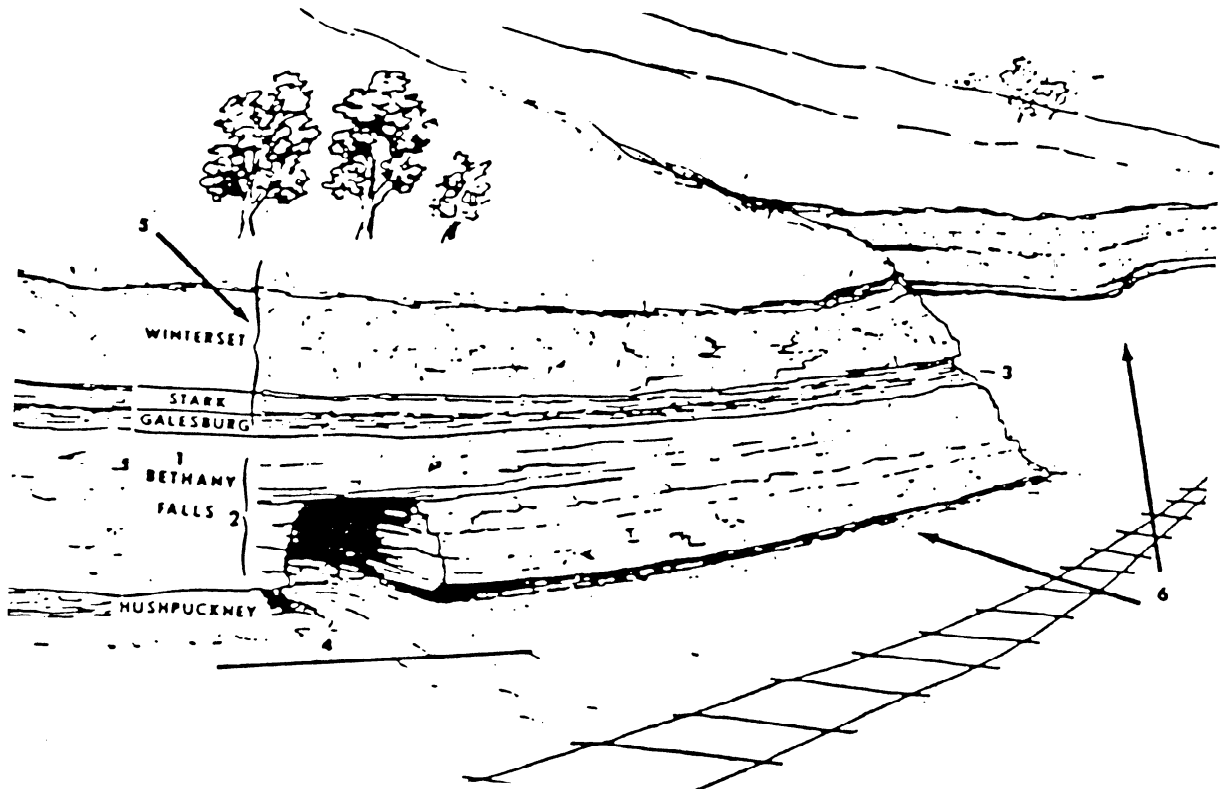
An artist's sketch showing six features contributing to the development of underground space (permission: US National Academy of Sciences, Tunneling Technology Newsletter).
